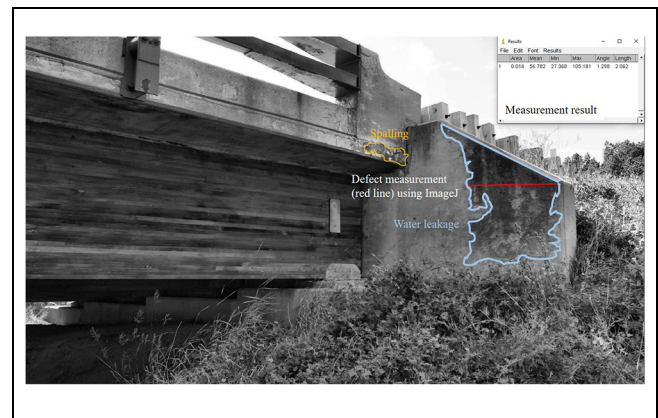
Measurement for the defect on the concrete abutment wingwall.
